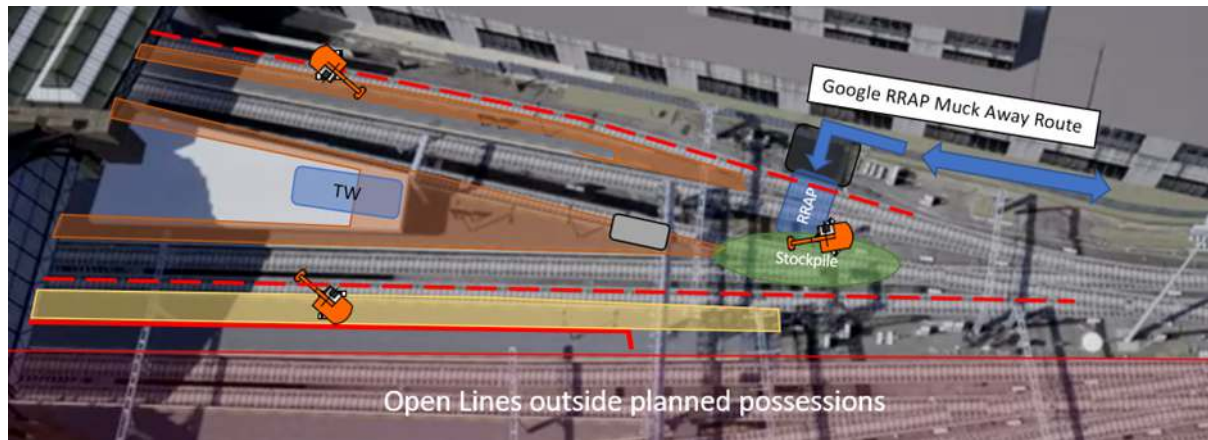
Stockpile arrangement during front wall foundation excavation (Platforms 7 – 10).
